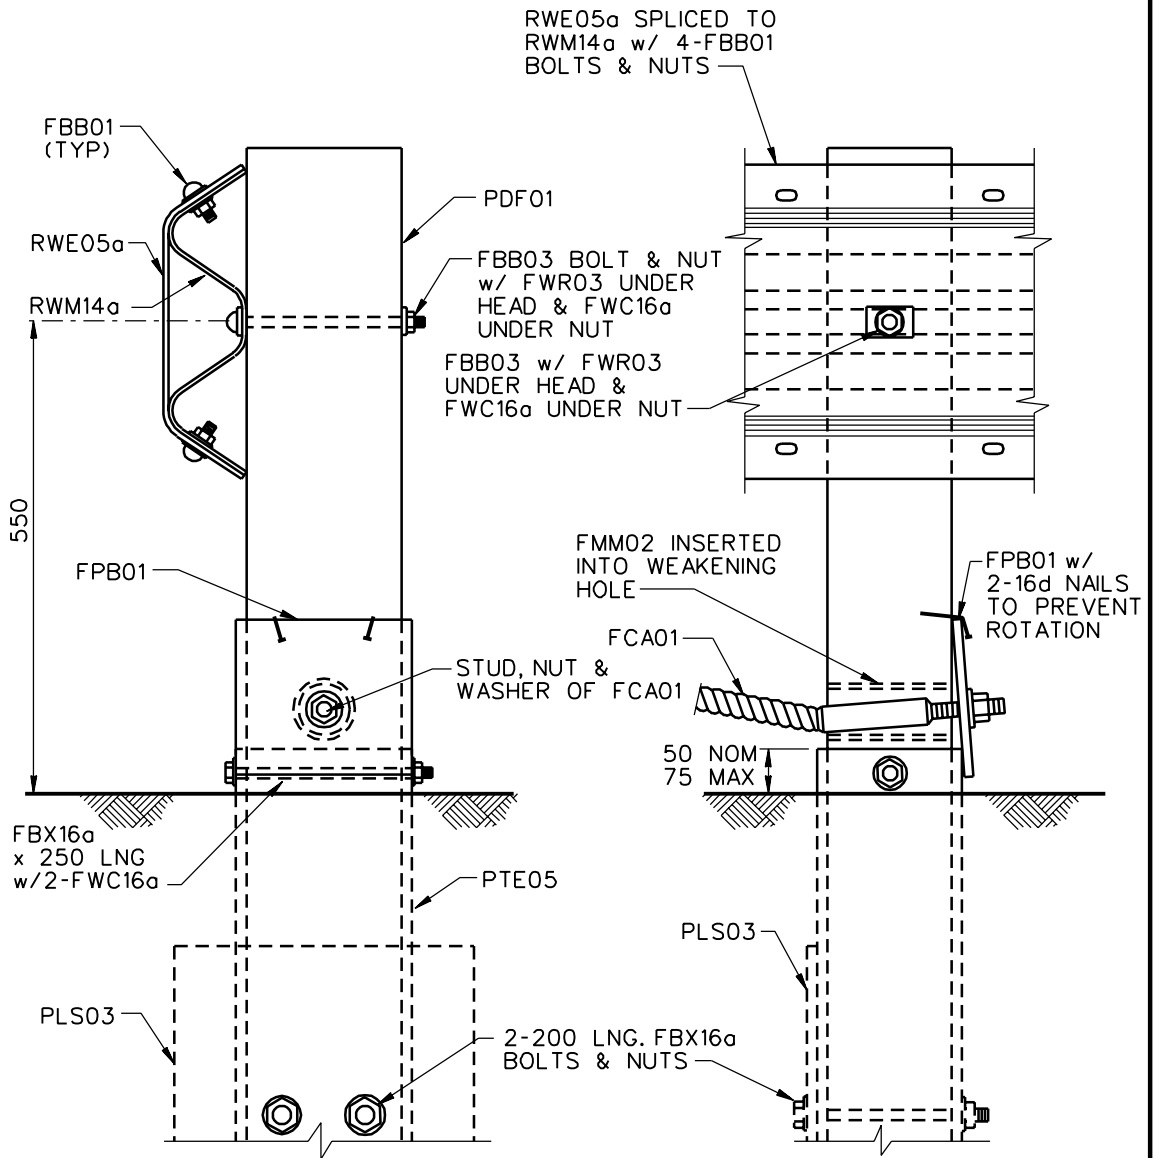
DETAIL C: ANCHOR PLATE ASSEMBLY DETAILS
